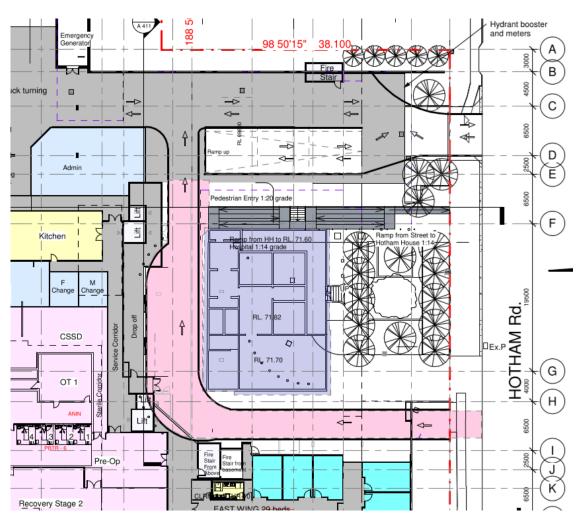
Ground floor arrangement with Hotham House retained and alternate driveway location. No hospital lobby and administration/reception moved to north and disconnected from entry.
